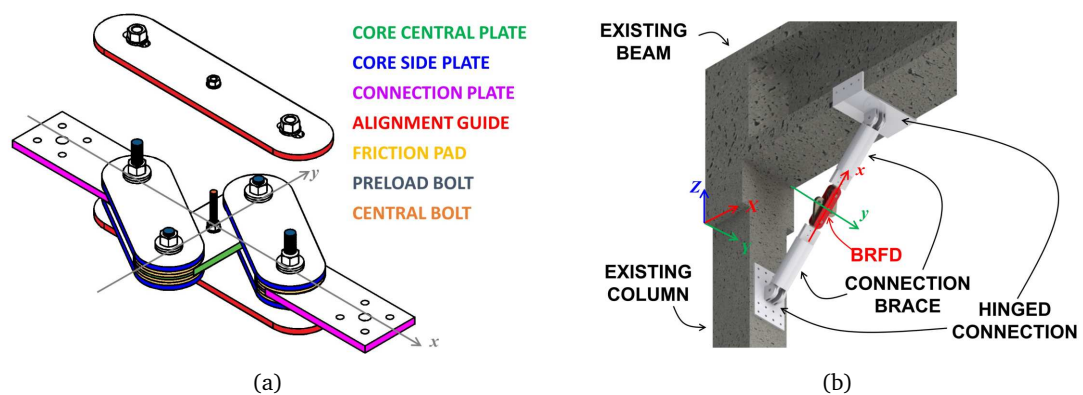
BRFD (a) axonometric view and (b) example of installation as a beam-to-column joint.
